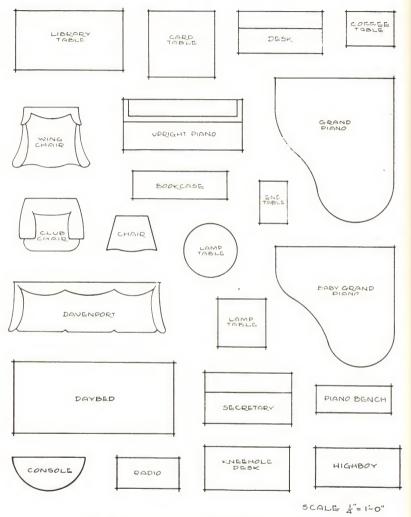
Scale Drawings for Typical Pieces of Furniture
